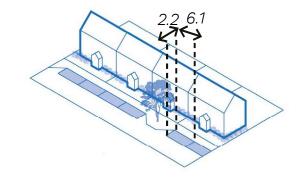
Illustrative diagram showing an indicative layout and minimum dimensions of on-street parking space.
